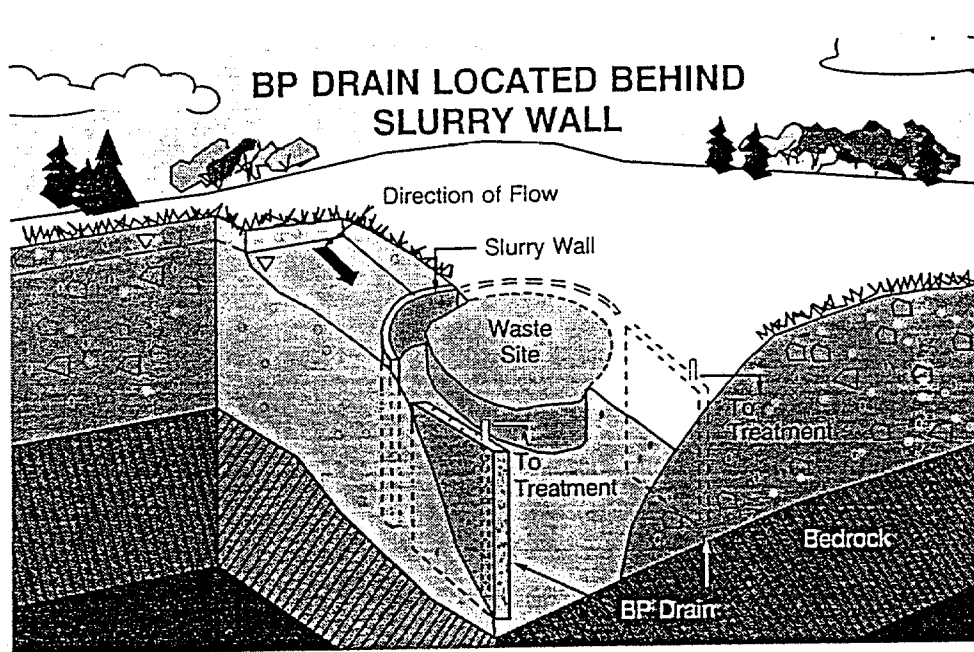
Schematic of Slurry Wall and Bio-Polymer System to Dewater Landfill
